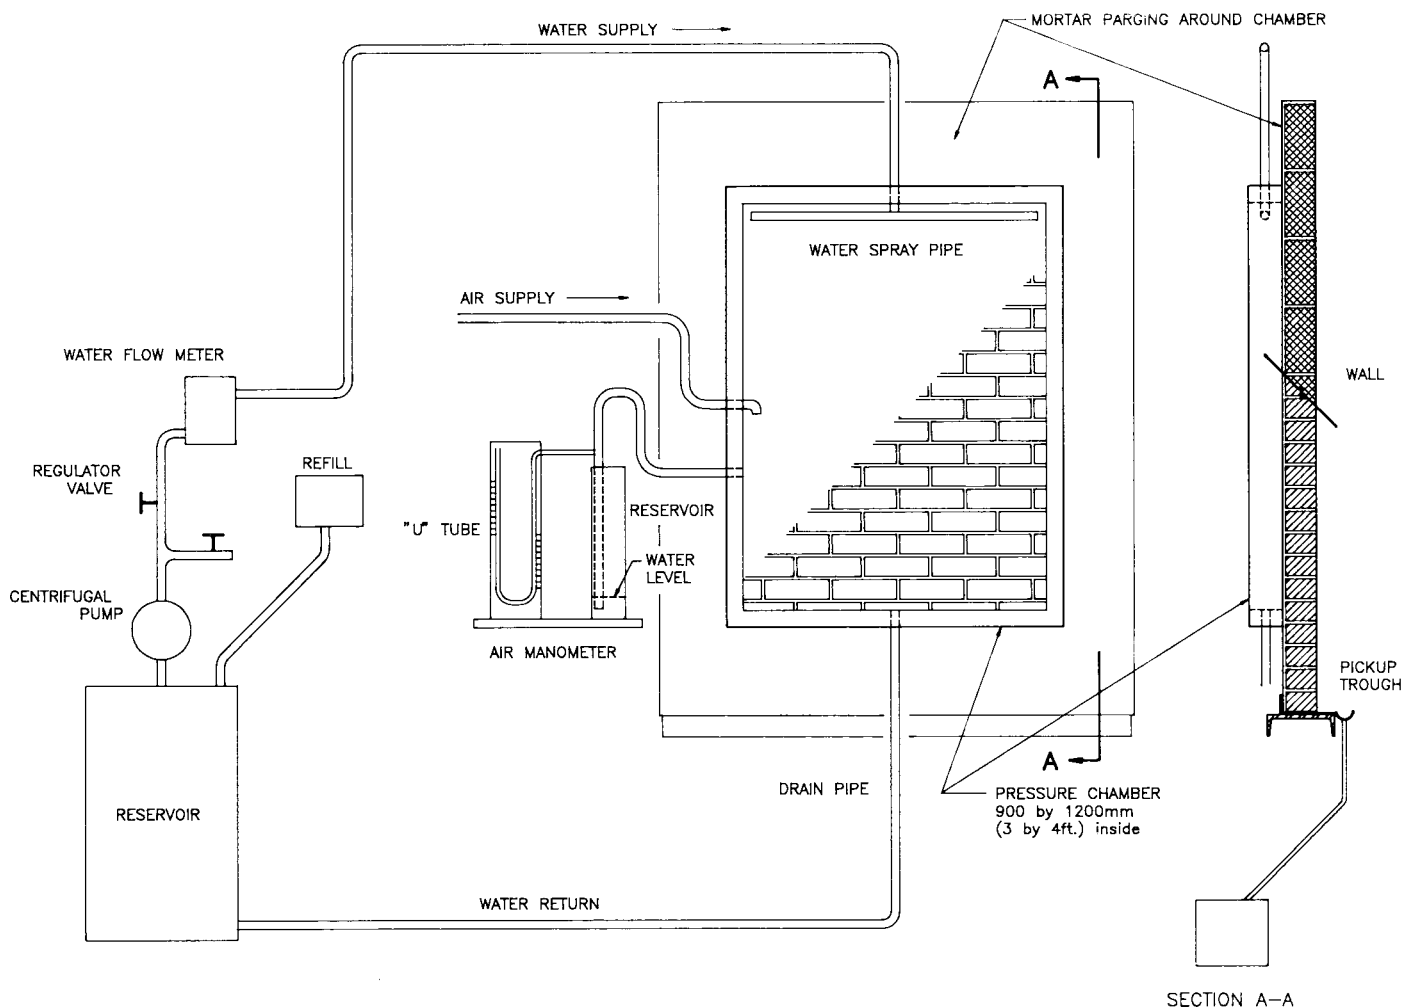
General Arrangement of Water Penetration Testing Chamber System
